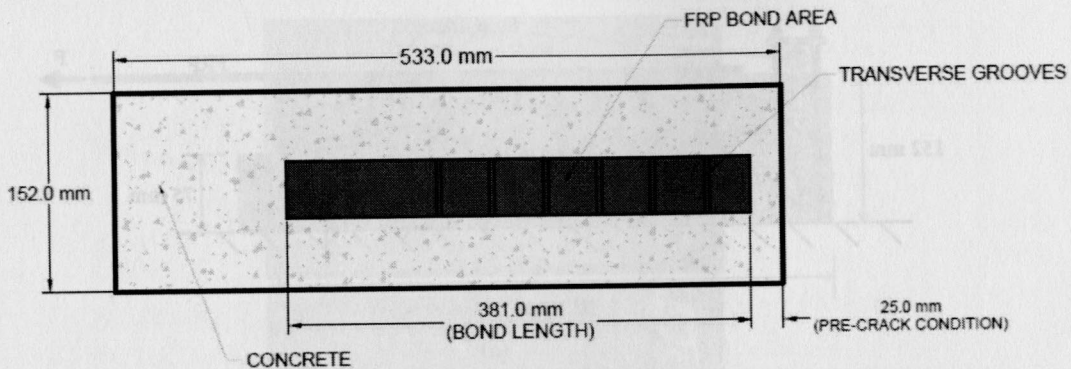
Grooves and pre-crack condition dimensions of specimens
